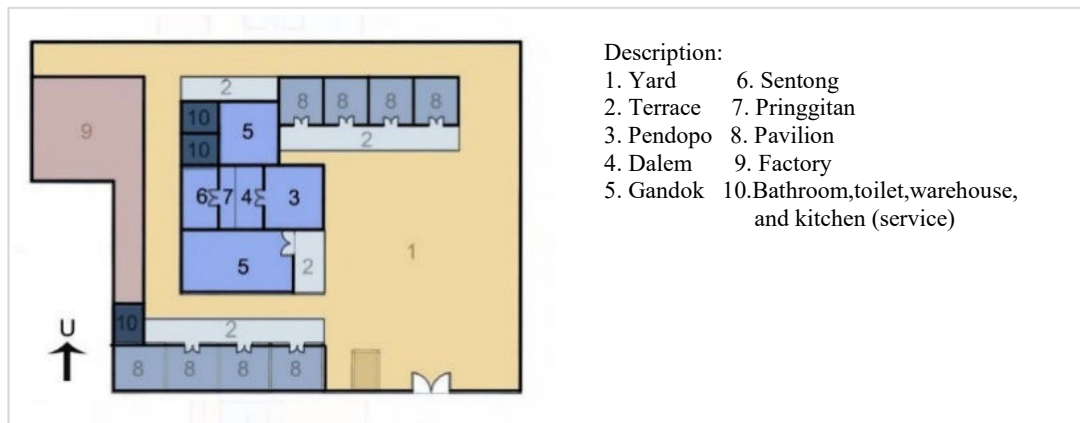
Djimatan floor plan, an example of a batik merchant's house with Javanese spatial patterns Jawa
